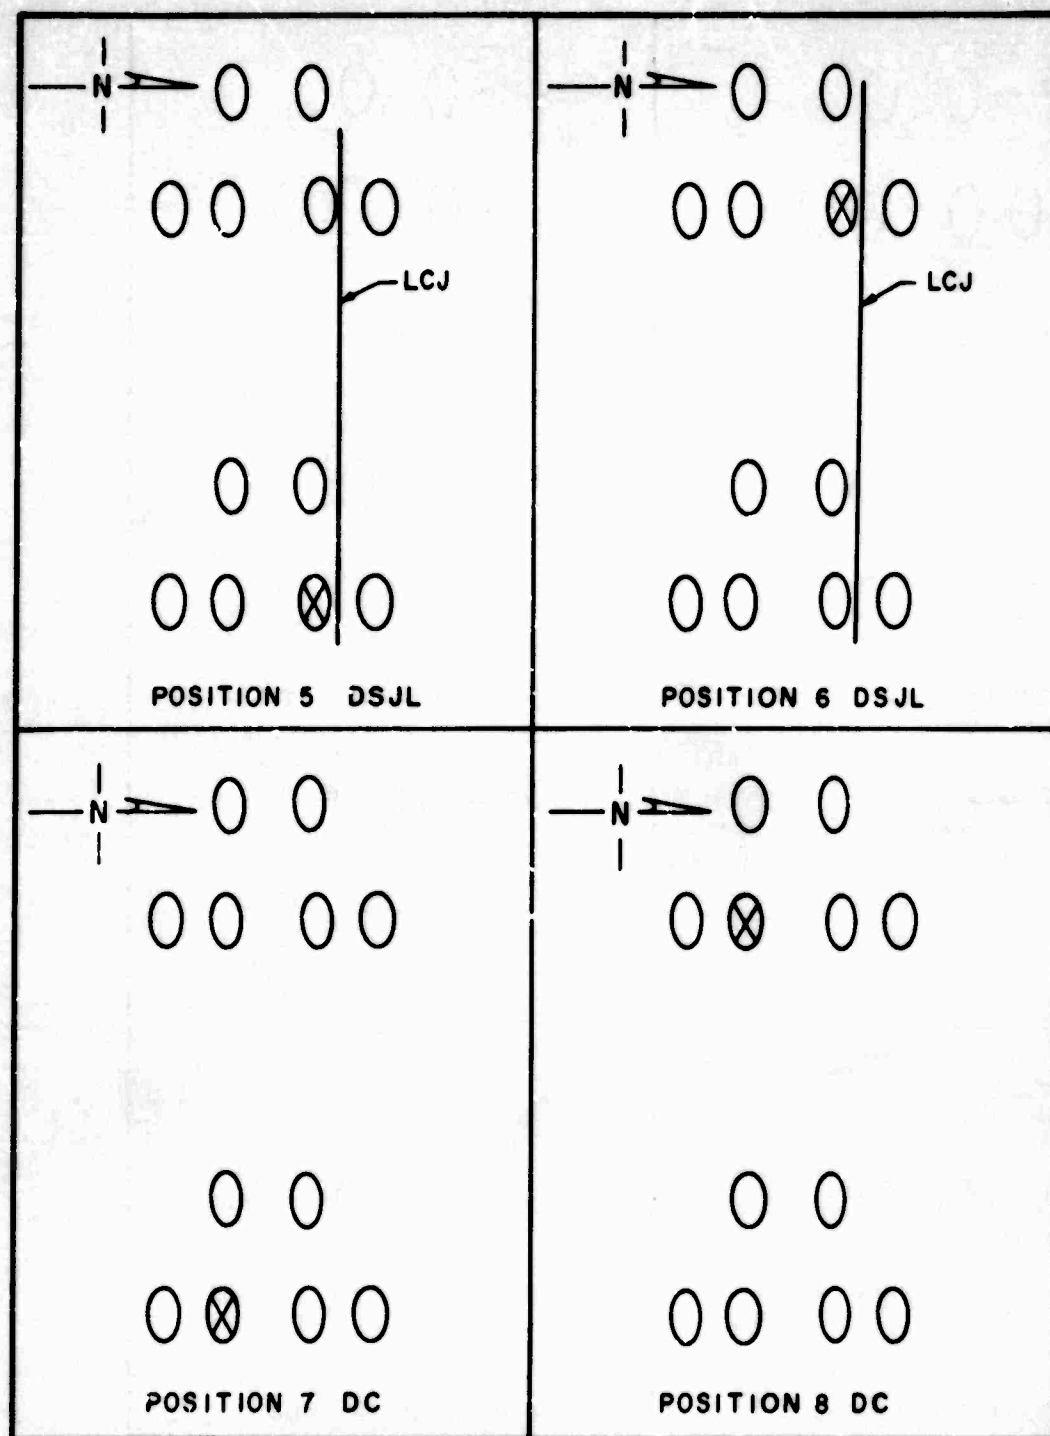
Wheel Positions for Twin-Tandem Dynamic Load Tests on Rigid Pavement Test Section
